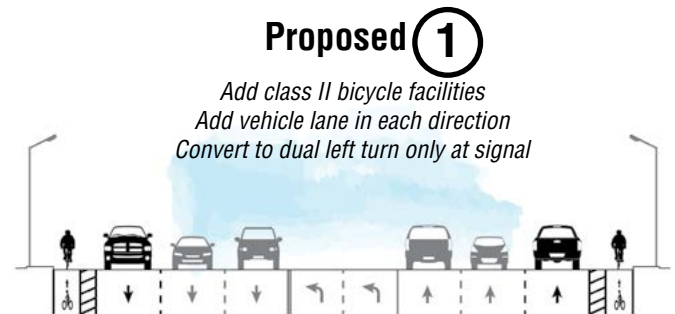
Garnet Avenue/Balboa Avenue Between Santa Fe Street and Moraga Avenue
